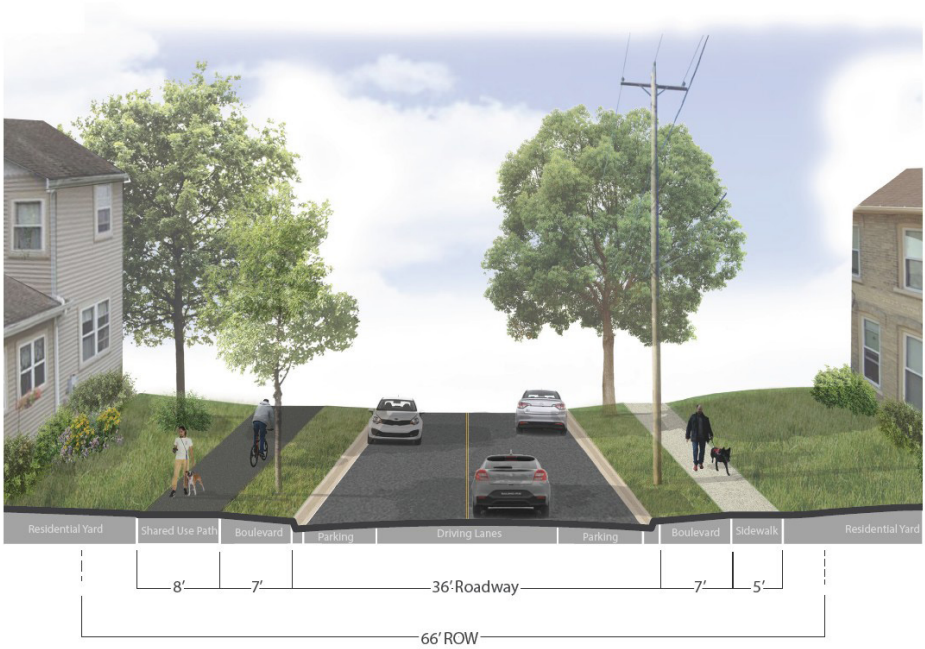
Cross section and plan view study of a shared use path along Fourth St.
